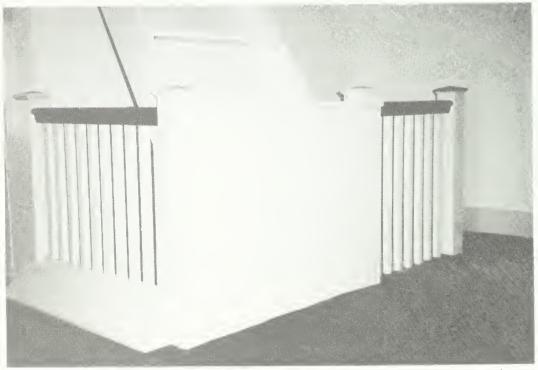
Second-story hall (Room 201), looking northeast to staircase balustrade.
